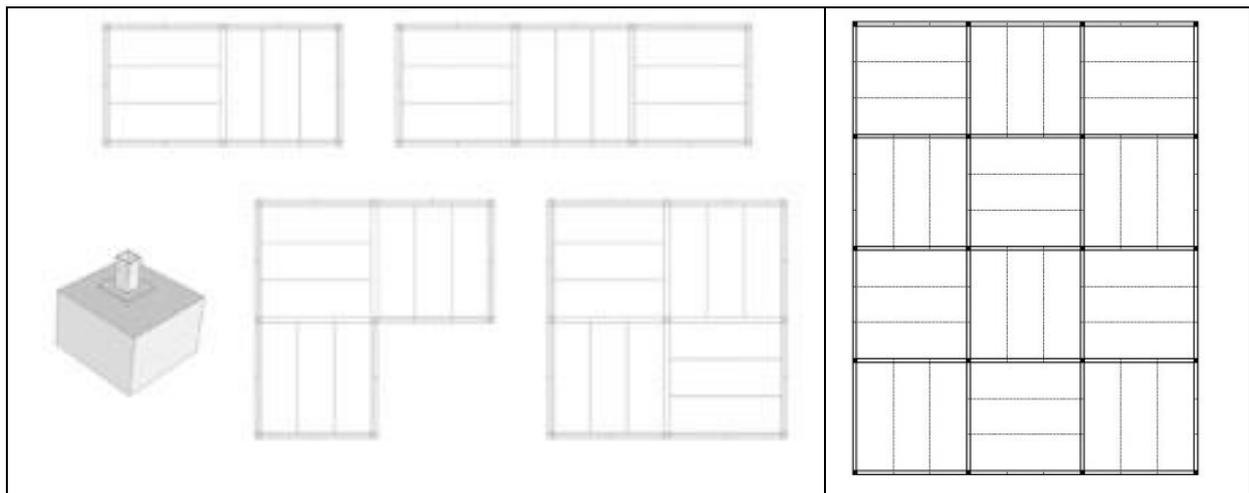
Reinforced concrete footing [10] and module aggregation structure
